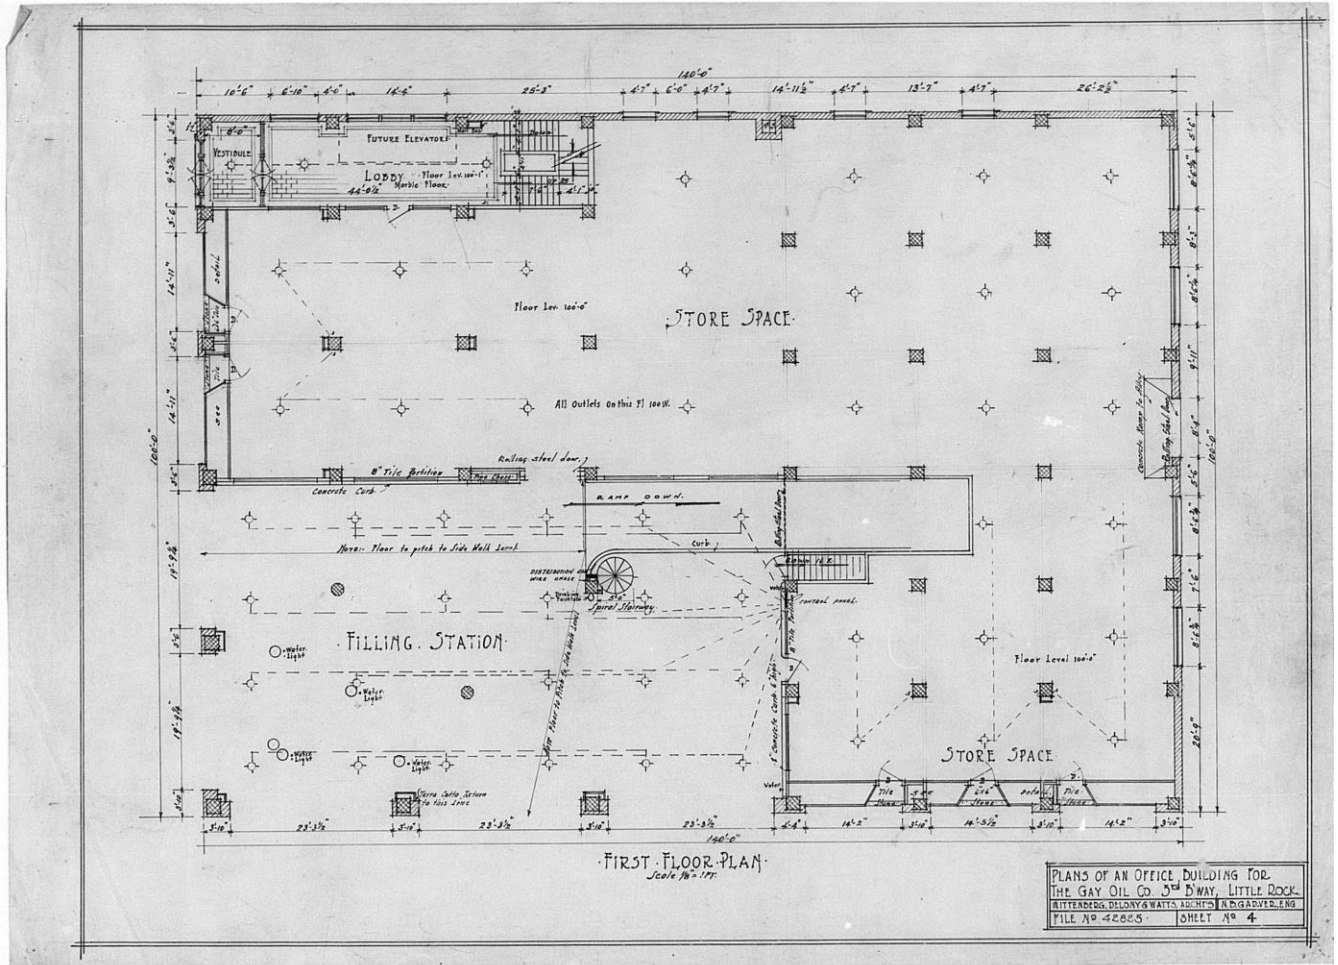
First Floor Plan Drawing for the Gay Oil Company Building
